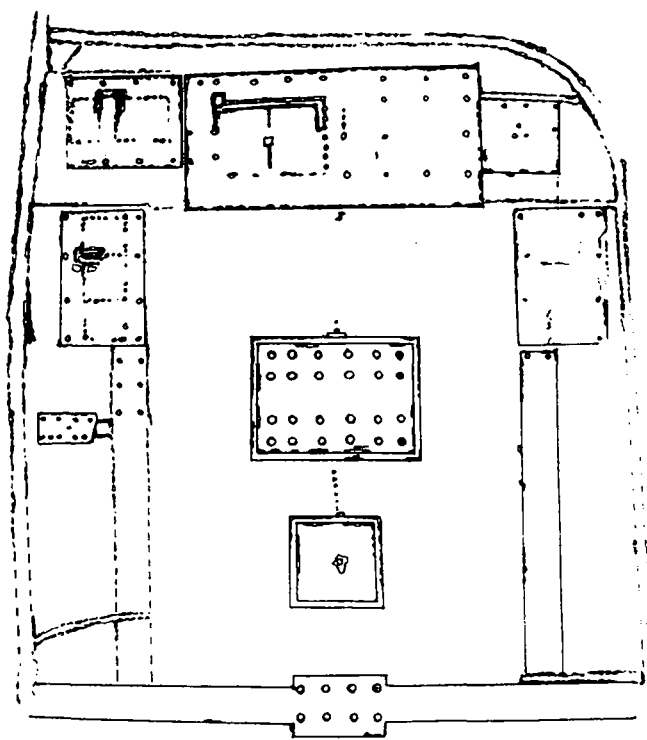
Excavation plan of Nüng-sa 陵寺 능사
